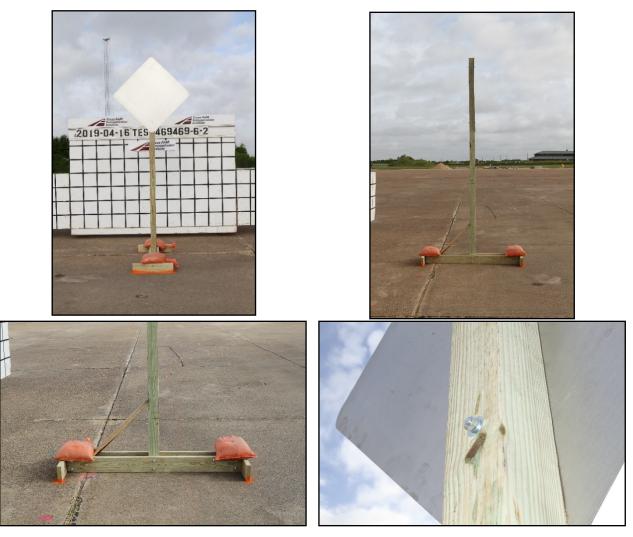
Single Wood Post Skid-Mounted Sign prior to Test No. 469469-06-02.
